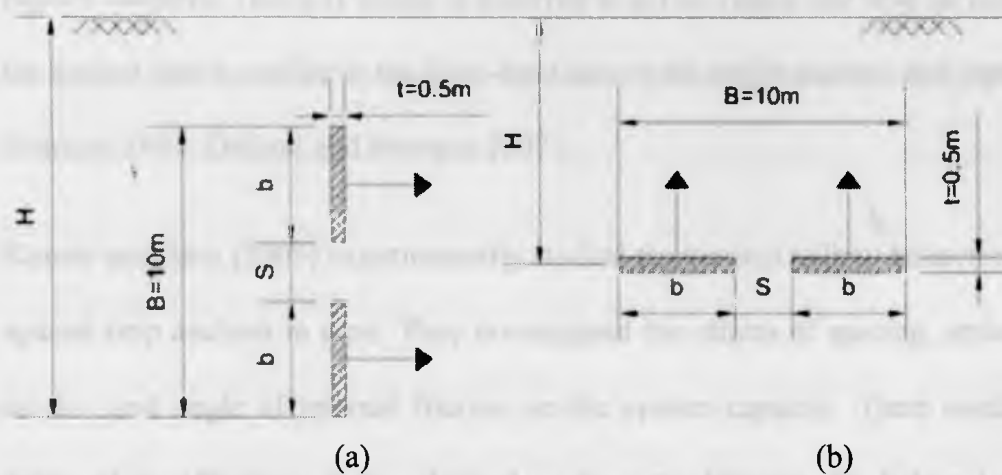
2: Dimensions and configuration of the anchors studied. (a) vertical anchor and (b) horizontal anchor
